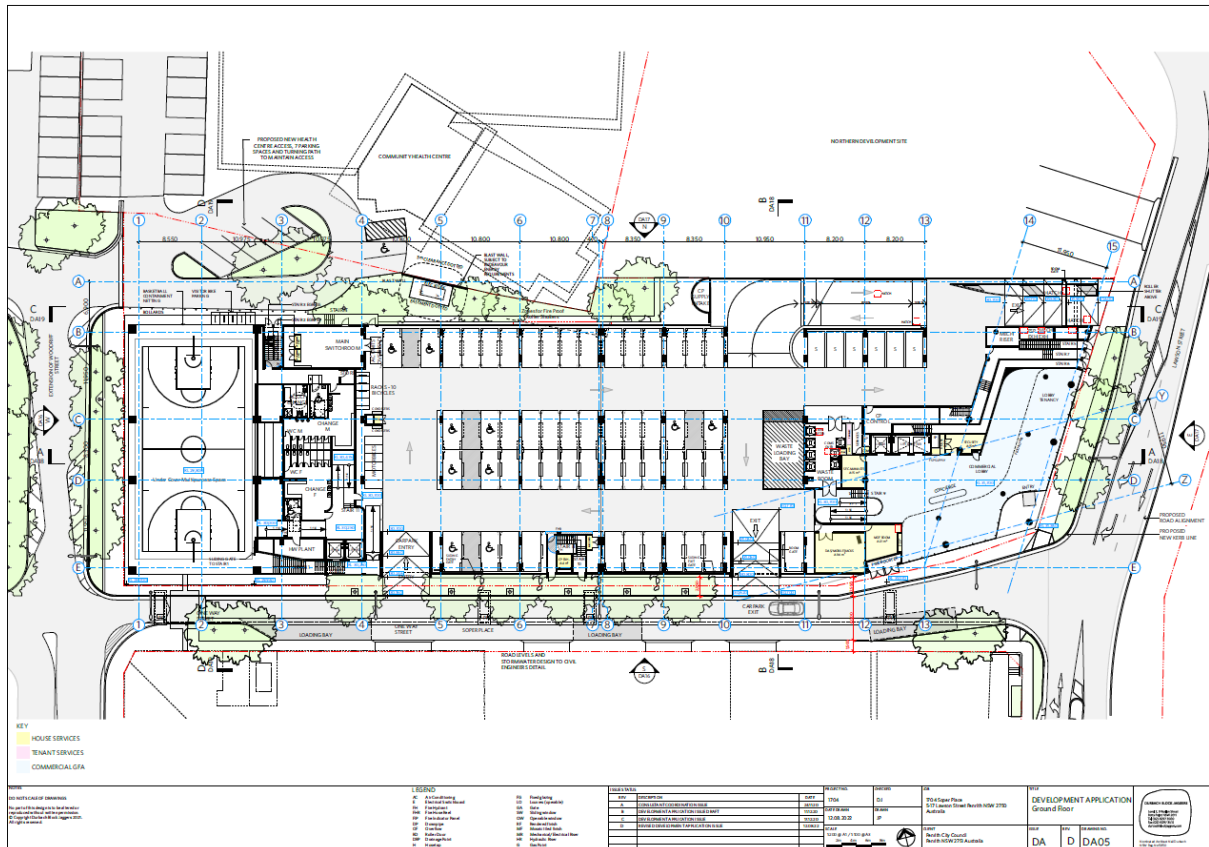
Extract of proposed ground floor plan (Source: DBJ, Applicant Architect)
